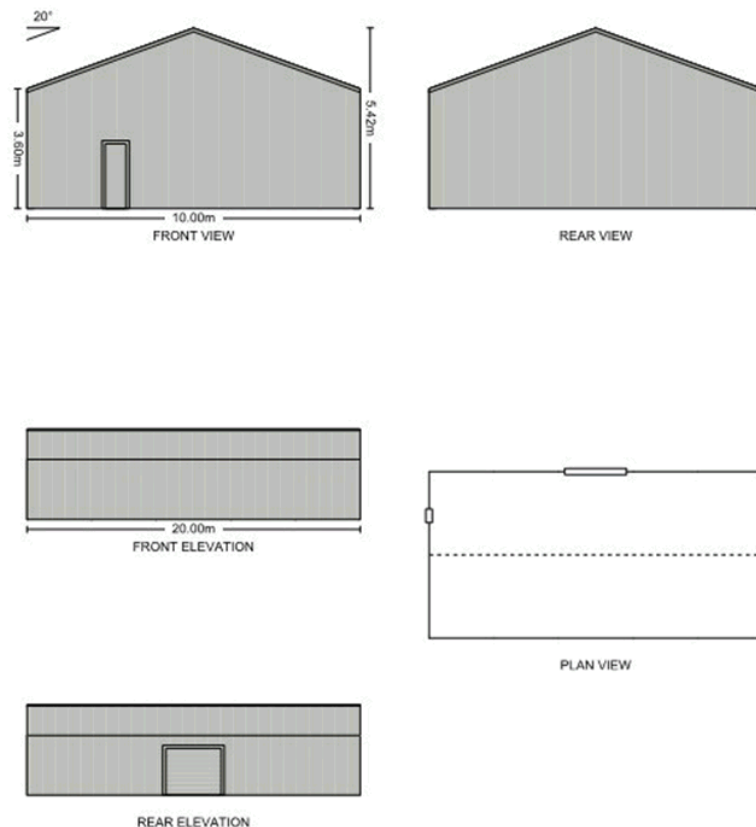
Elevation and floor plan of the proposed storage shed at 30 Mcrobies Road, South Hobart.
